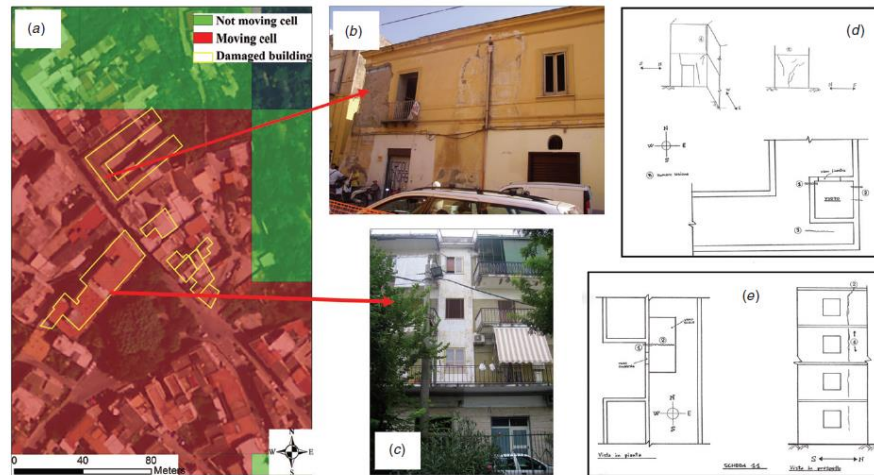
(a) Close view map of moving cells and damaged buildings in the municipality of Sarno (Campania region, southern Italy); (b) a damaged masonry building with a sketch of surveyed cracks (d); (c) a damaged reinforced concrete building with a sketch of surveyed cracks (e) (Cascini et al., 2013a).
